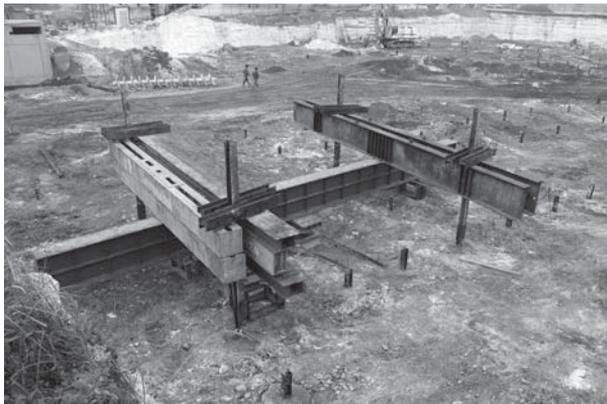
Inverted beam set prepared for the pile load test (fot. by author)
